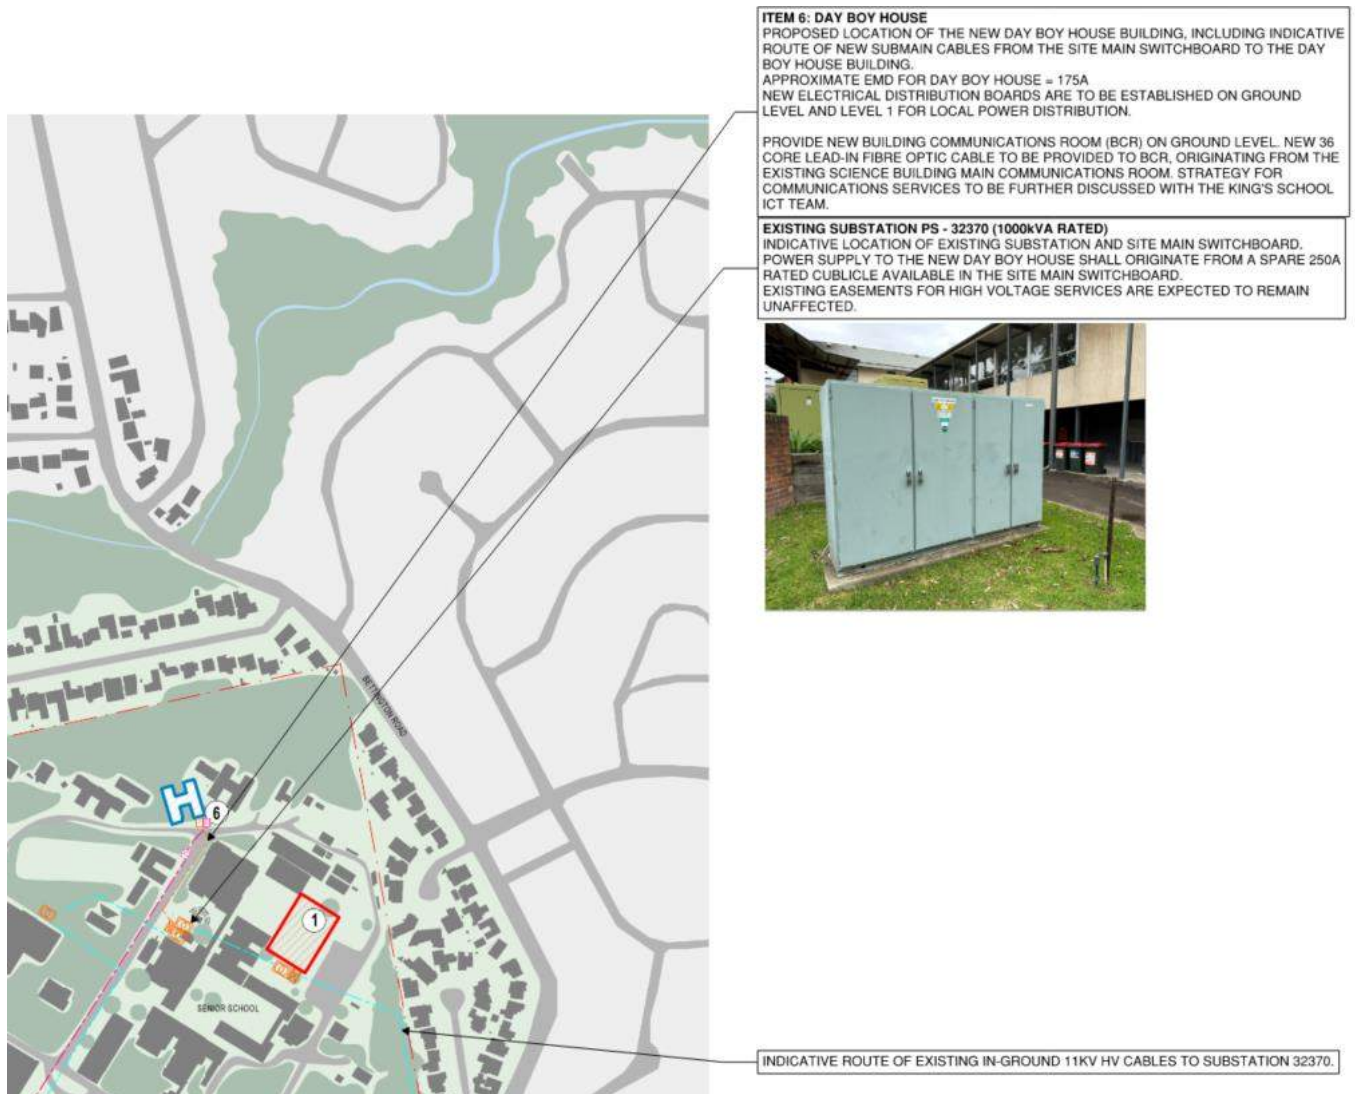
DAY BOY HOUSE ELECTRICAL INFRASTRUCTURE SITE PLAN
